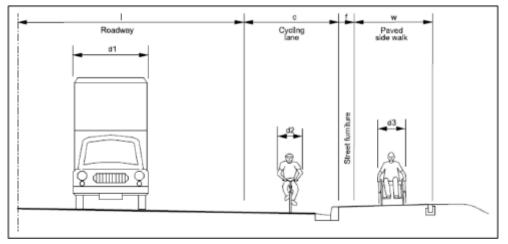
Typical cross-section of a complete street with a walkway/cycle track
